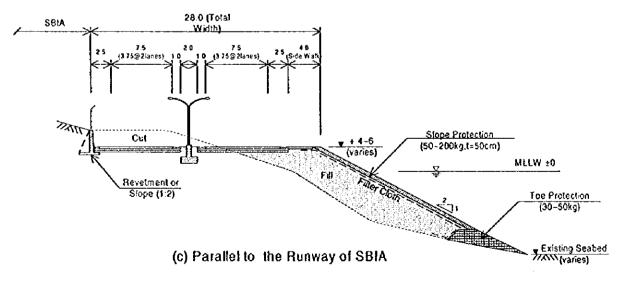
Typical Sections of the Access Road (Scale: 1/400)
